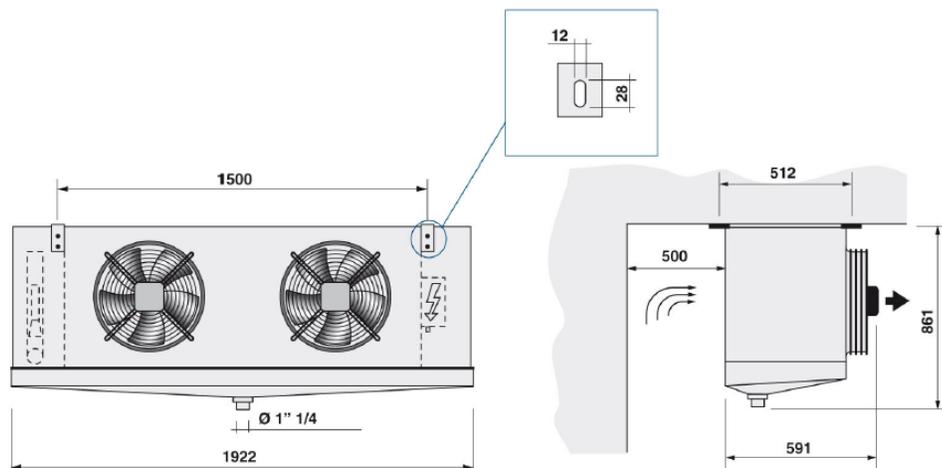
Stefani SCHN-0502 data sheet used for Chilled Storage evaporator assumptions
